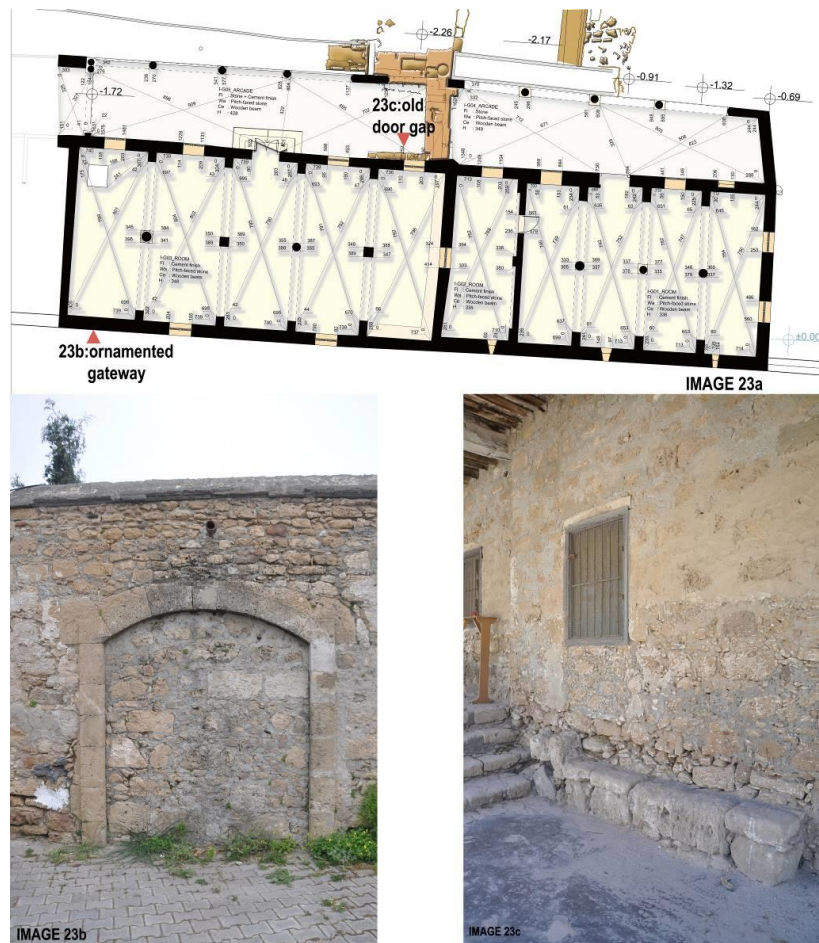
(a) Survey drawing of the south wing building, ground floor plan (b) Image of the ornamented gateway from south elevation (c) Image of the wall from arcade
